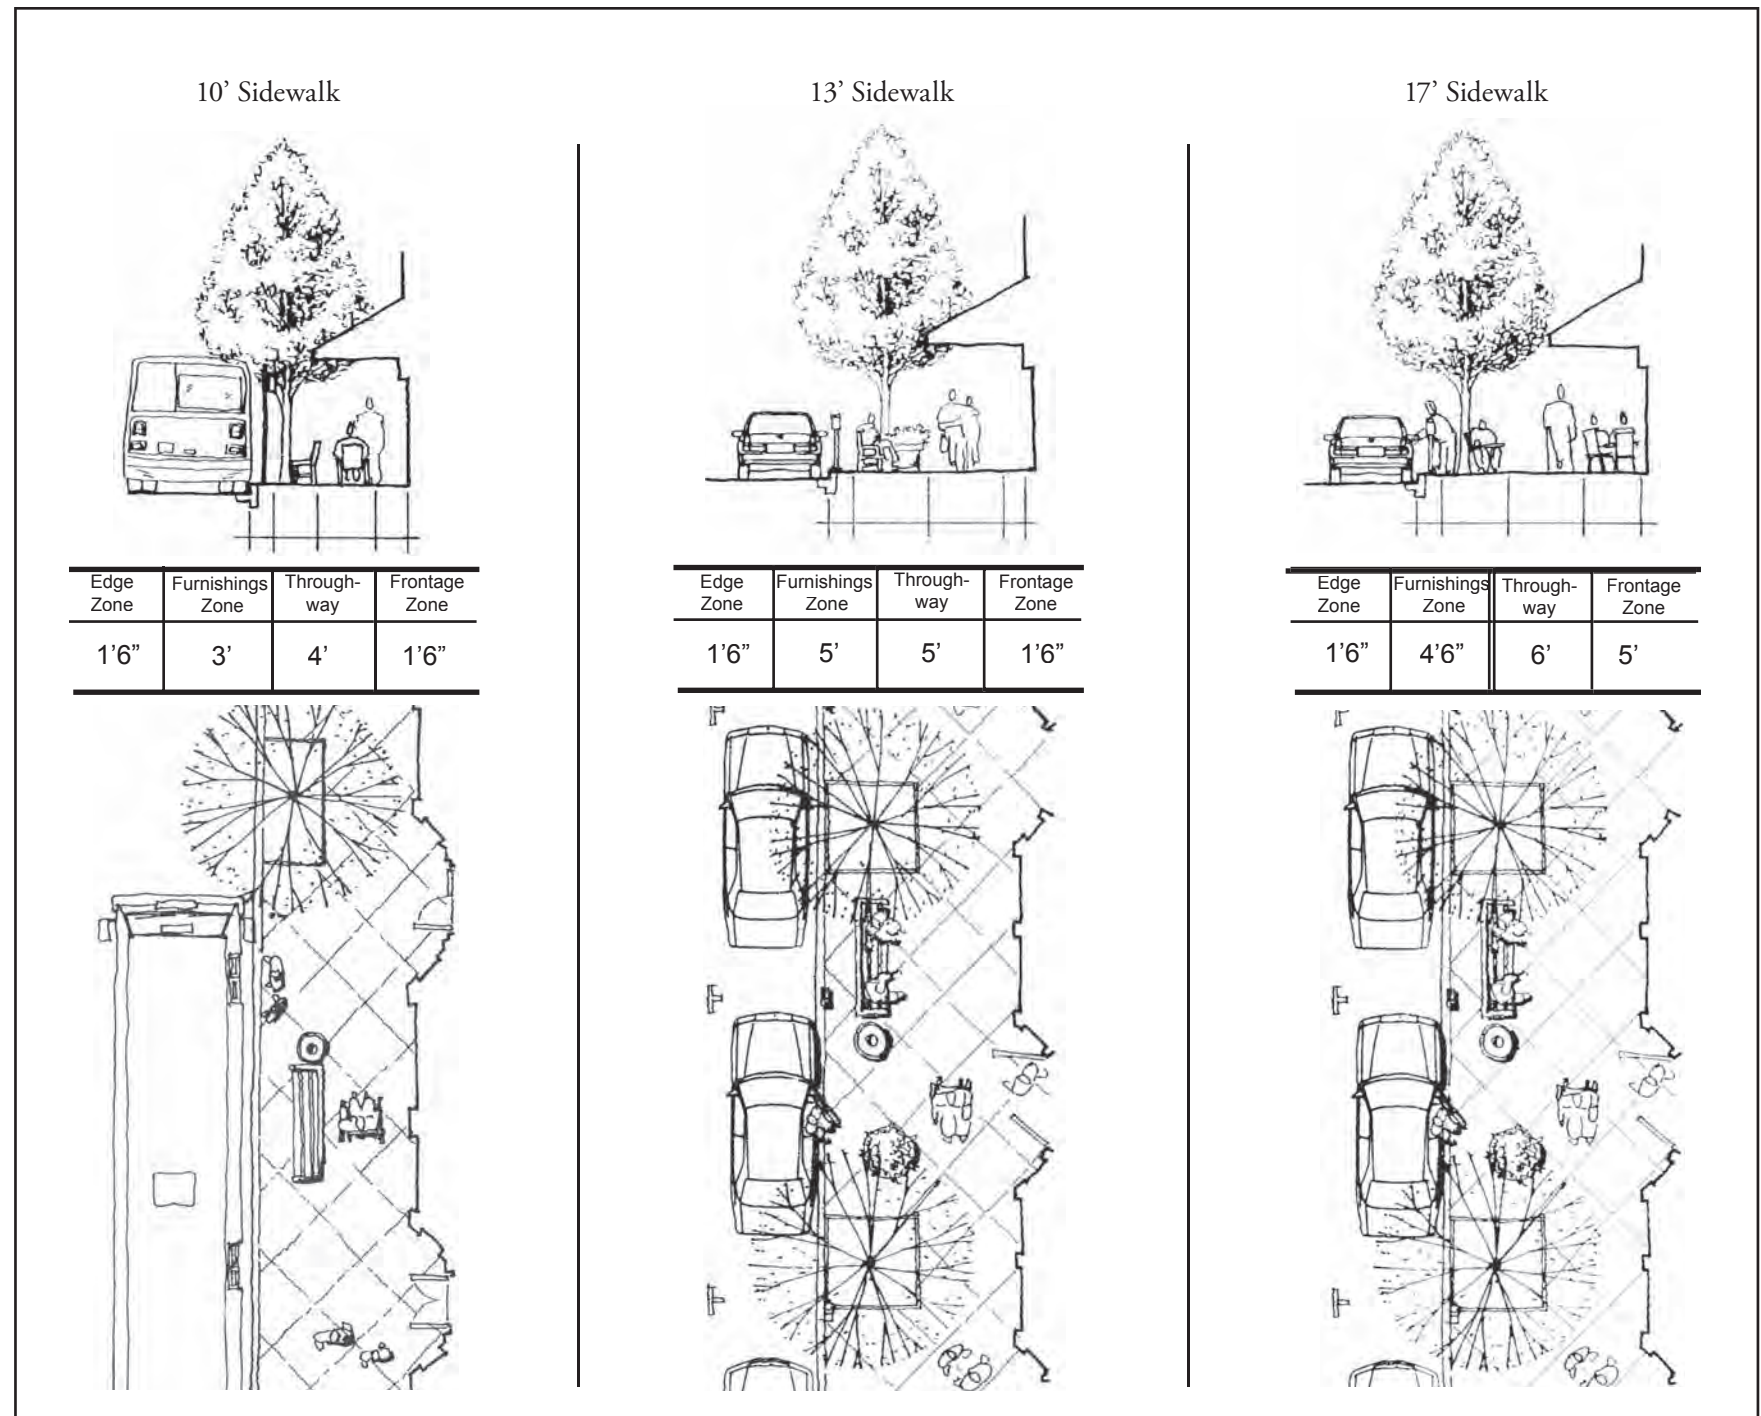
Different sidewalk widths support a different range of functions and activities. This is illustrated above for the typical sidewalk widths of 10, 13 and 17 feet proposed for El Camino Real.
